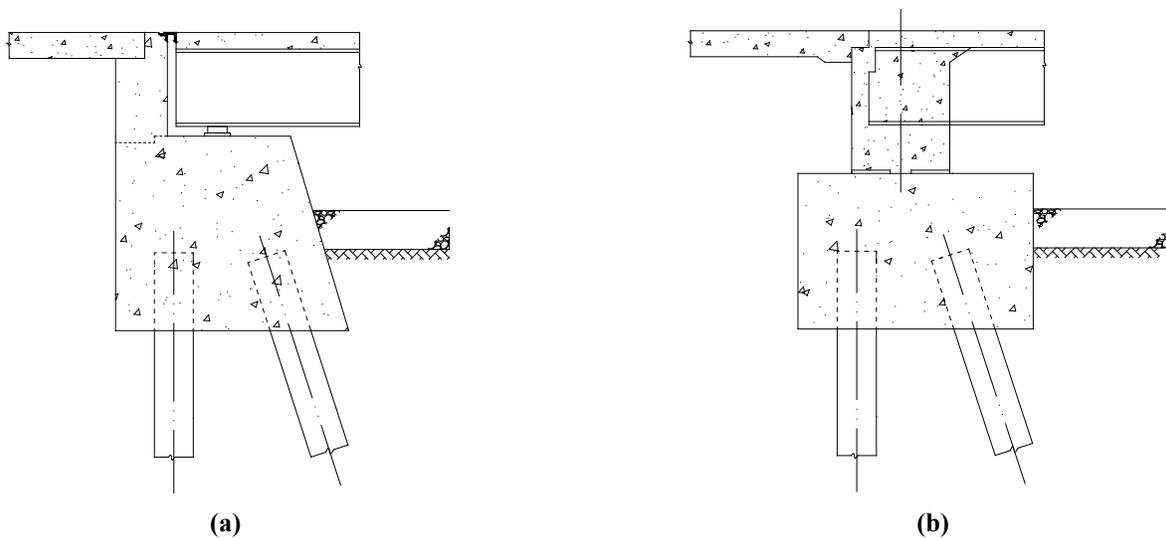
Conversion of a very short span bridge with moveable deck joints at the superstructure-abutment interface with integral abutment (a) before conversion, and (b) after conversion.
